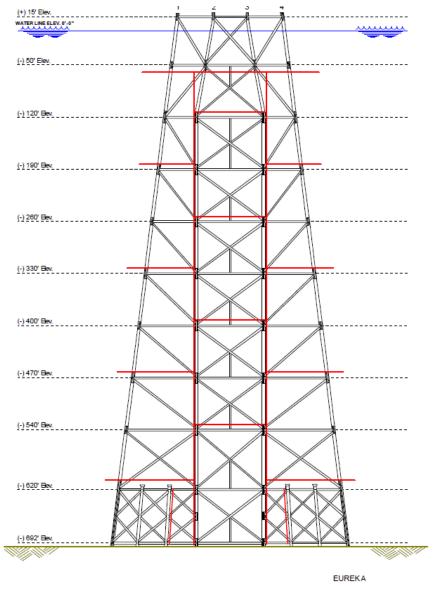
Example Cut Plan for Jacket Sectioning of Eureka Platform
